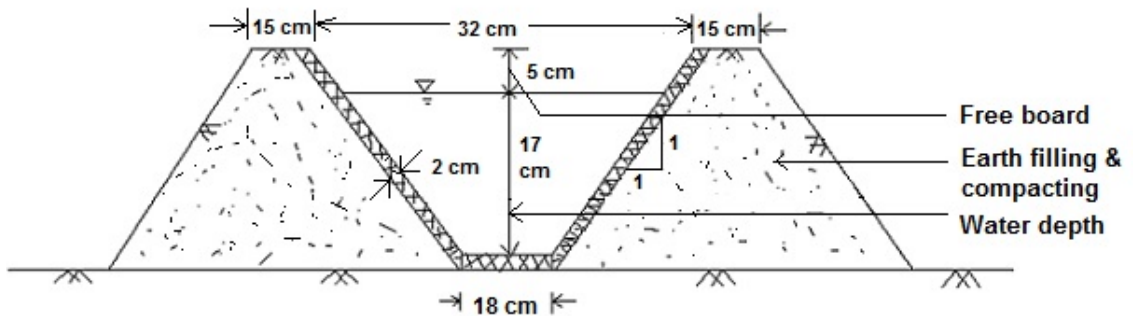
Typical cross section of a trapezoidal compacted earthen canal
